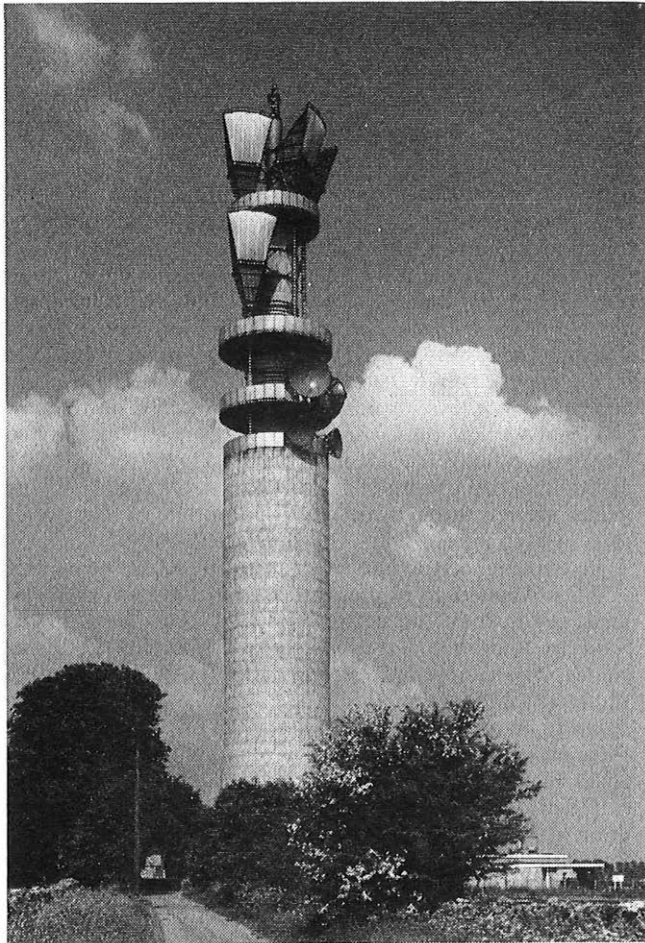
An earlier type of ferro-concrete tower at Wotton-under-Edge radio station
